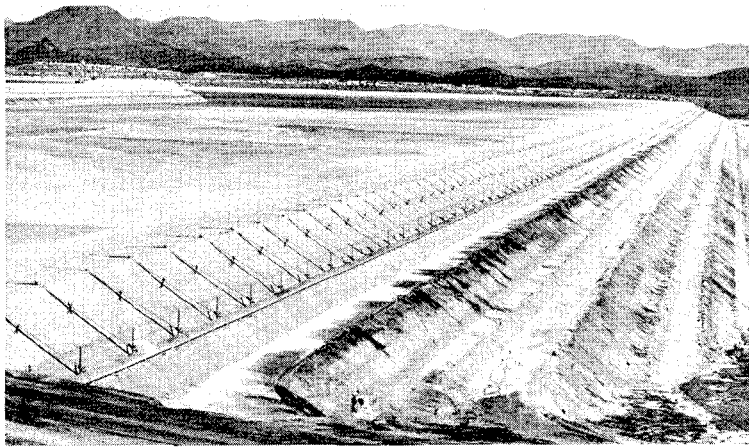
PHOTO A. VIEW SHOWING HEADERS AND LATERALS PLACED AFTER EMBANKMENT HAS BEEN RAISED BY DRAGLINE AT MORENCI, ARIZONA.
